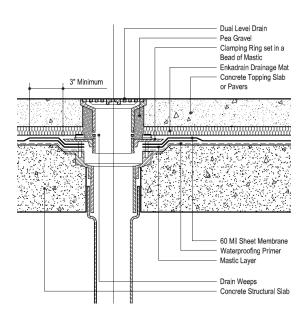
Bi-level drain in greenhouse floor and rainwater collection trough $^{\rm (16)}$
